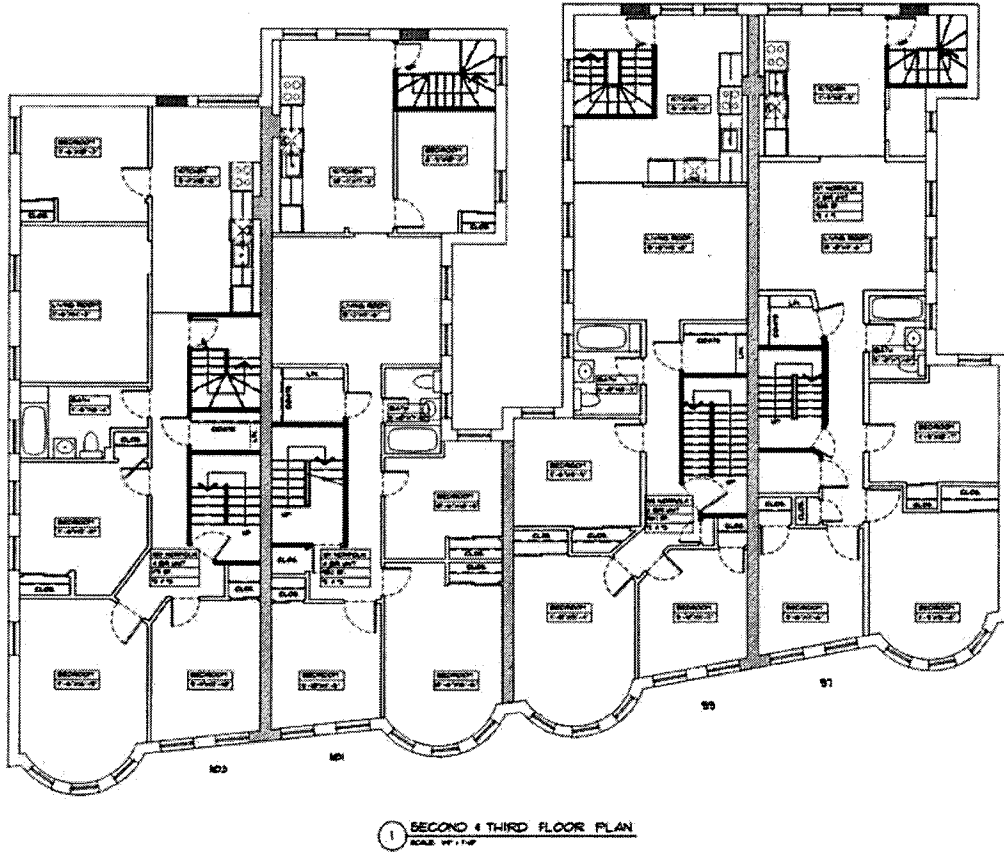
97-103 Norfolk Street, second and third floor plan.
